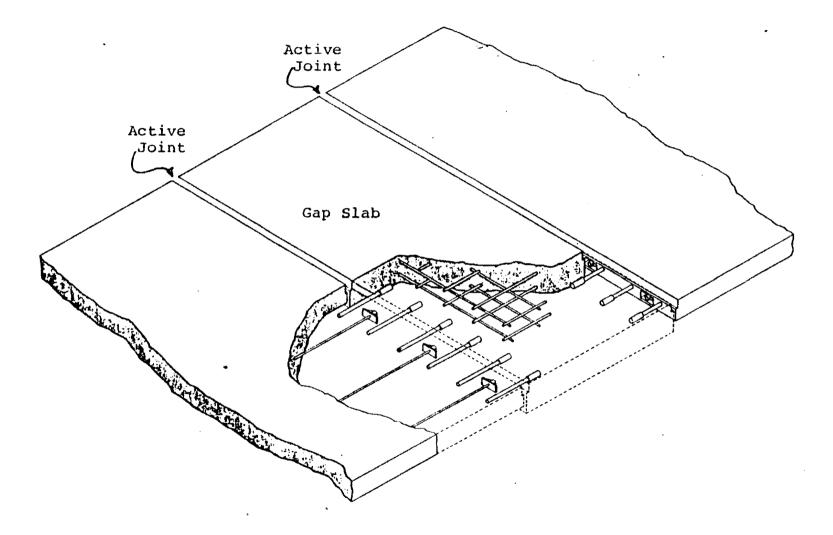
Prestressed pavement with active joints at each end of the gap slab.
